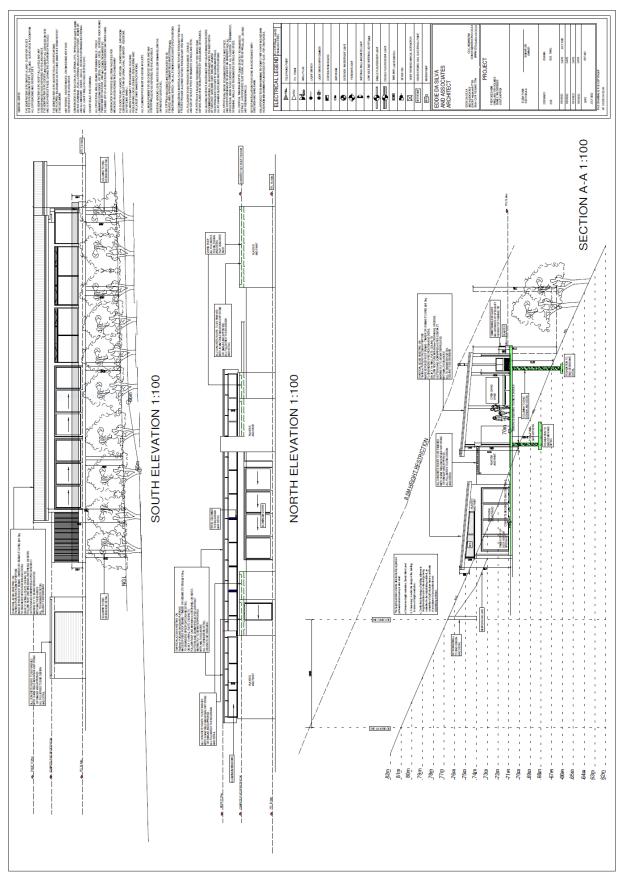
Main Dwelling – Elevations & Sections, Courtesy of Eddie Da Silva and Associates Architect. Please see Annexure C.
